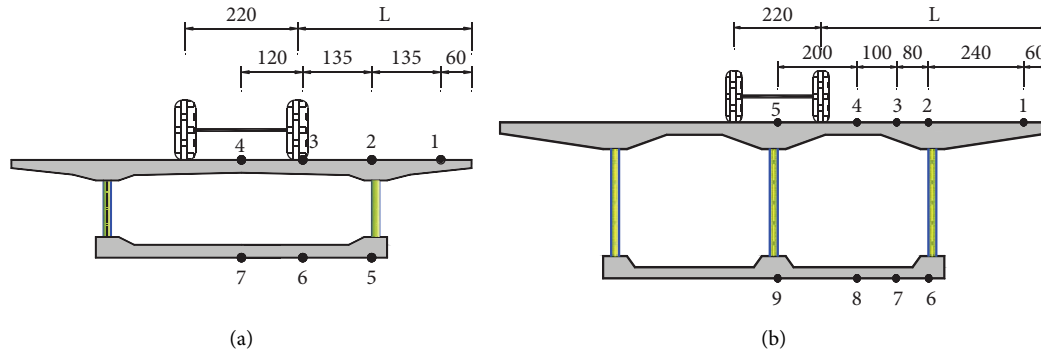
Schematic layout of the measuring points of the composite box girder: (a) single box, single cell measuring point arrangement (cm) and (b) single box, twin cell measuring point arrangement (cm).
